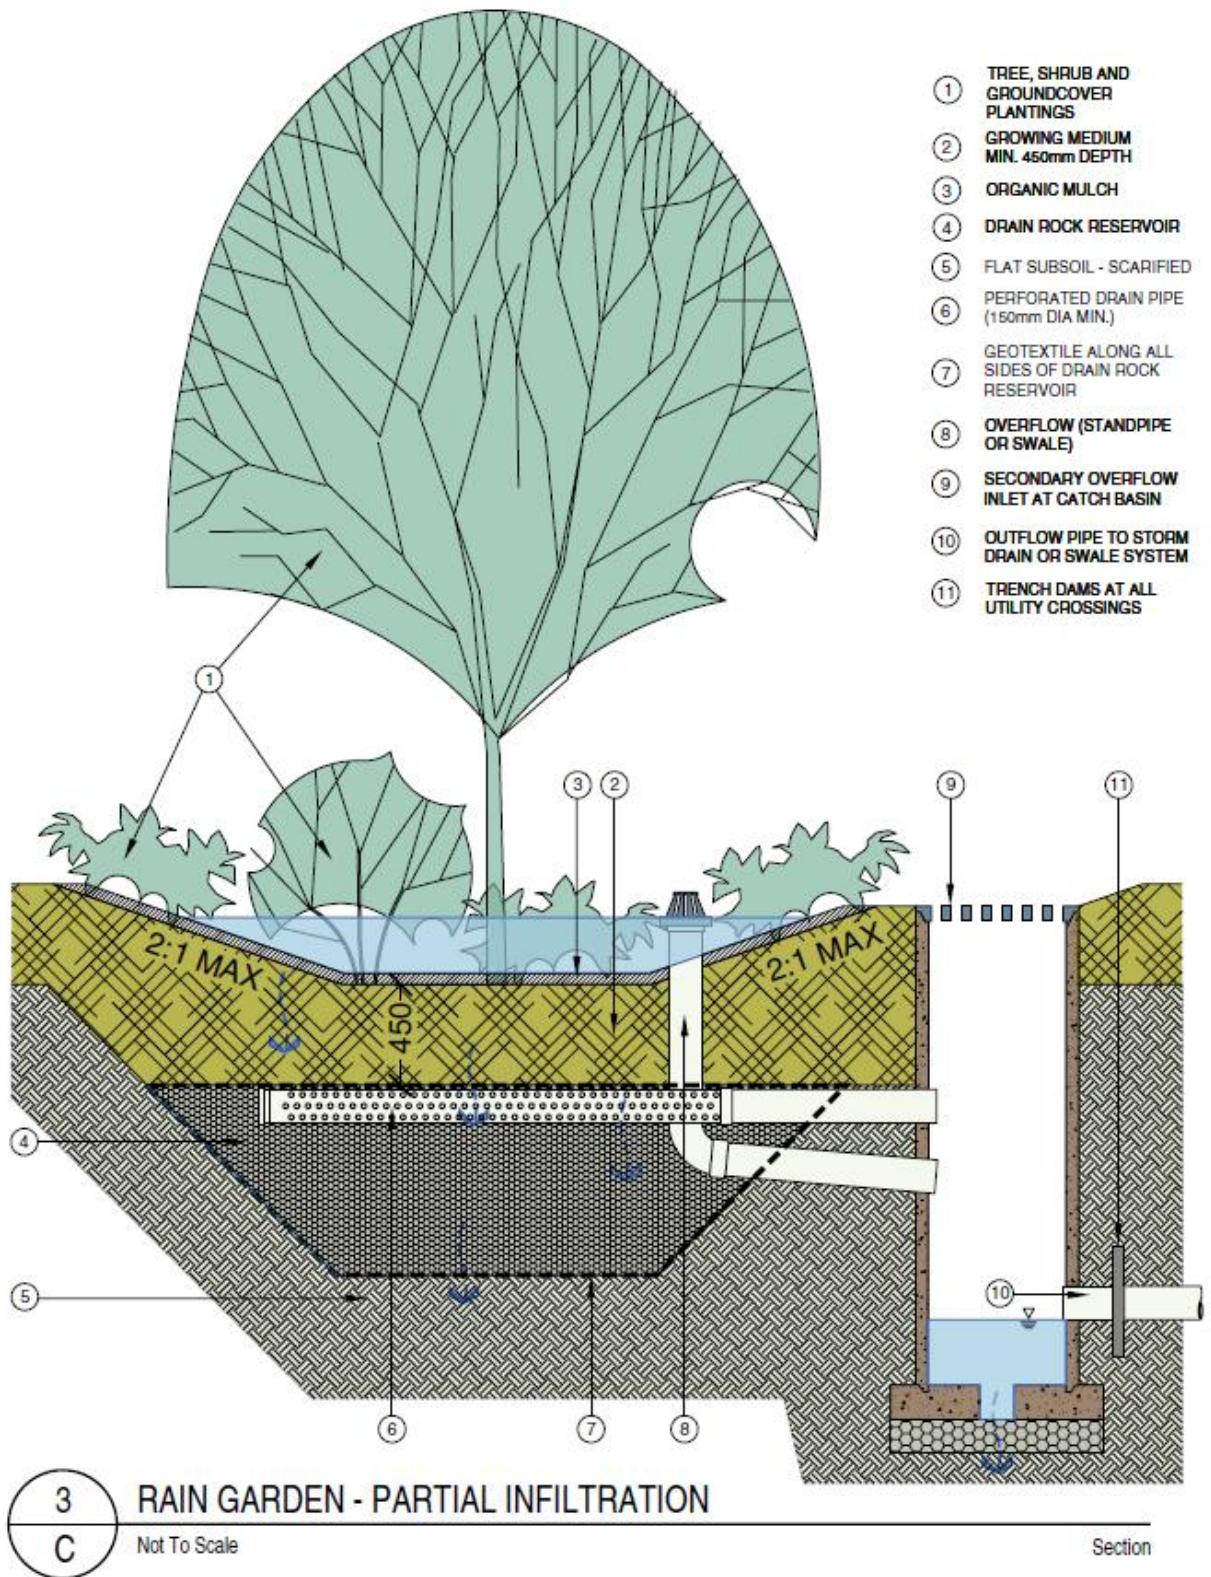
Cross section showing the typical components of a rain garden including the planting medium, the drainage rockbed, and the overflow and drainage plumbing (Metro Vancouver, 2005).
